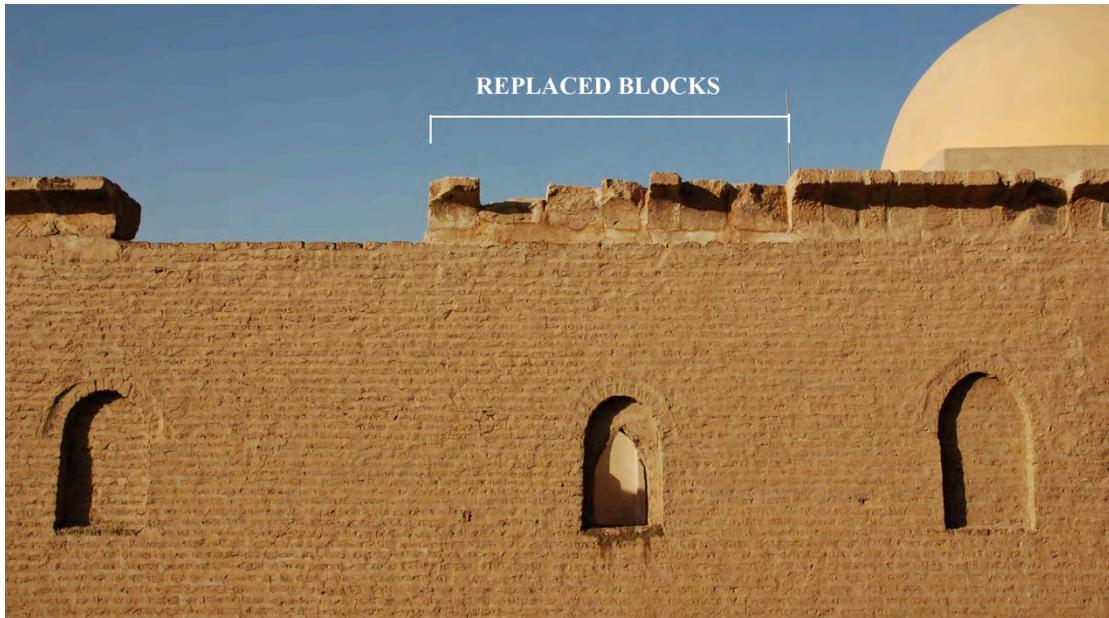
Seven replacement cornice blocks after re-installation on the east wall of the church
